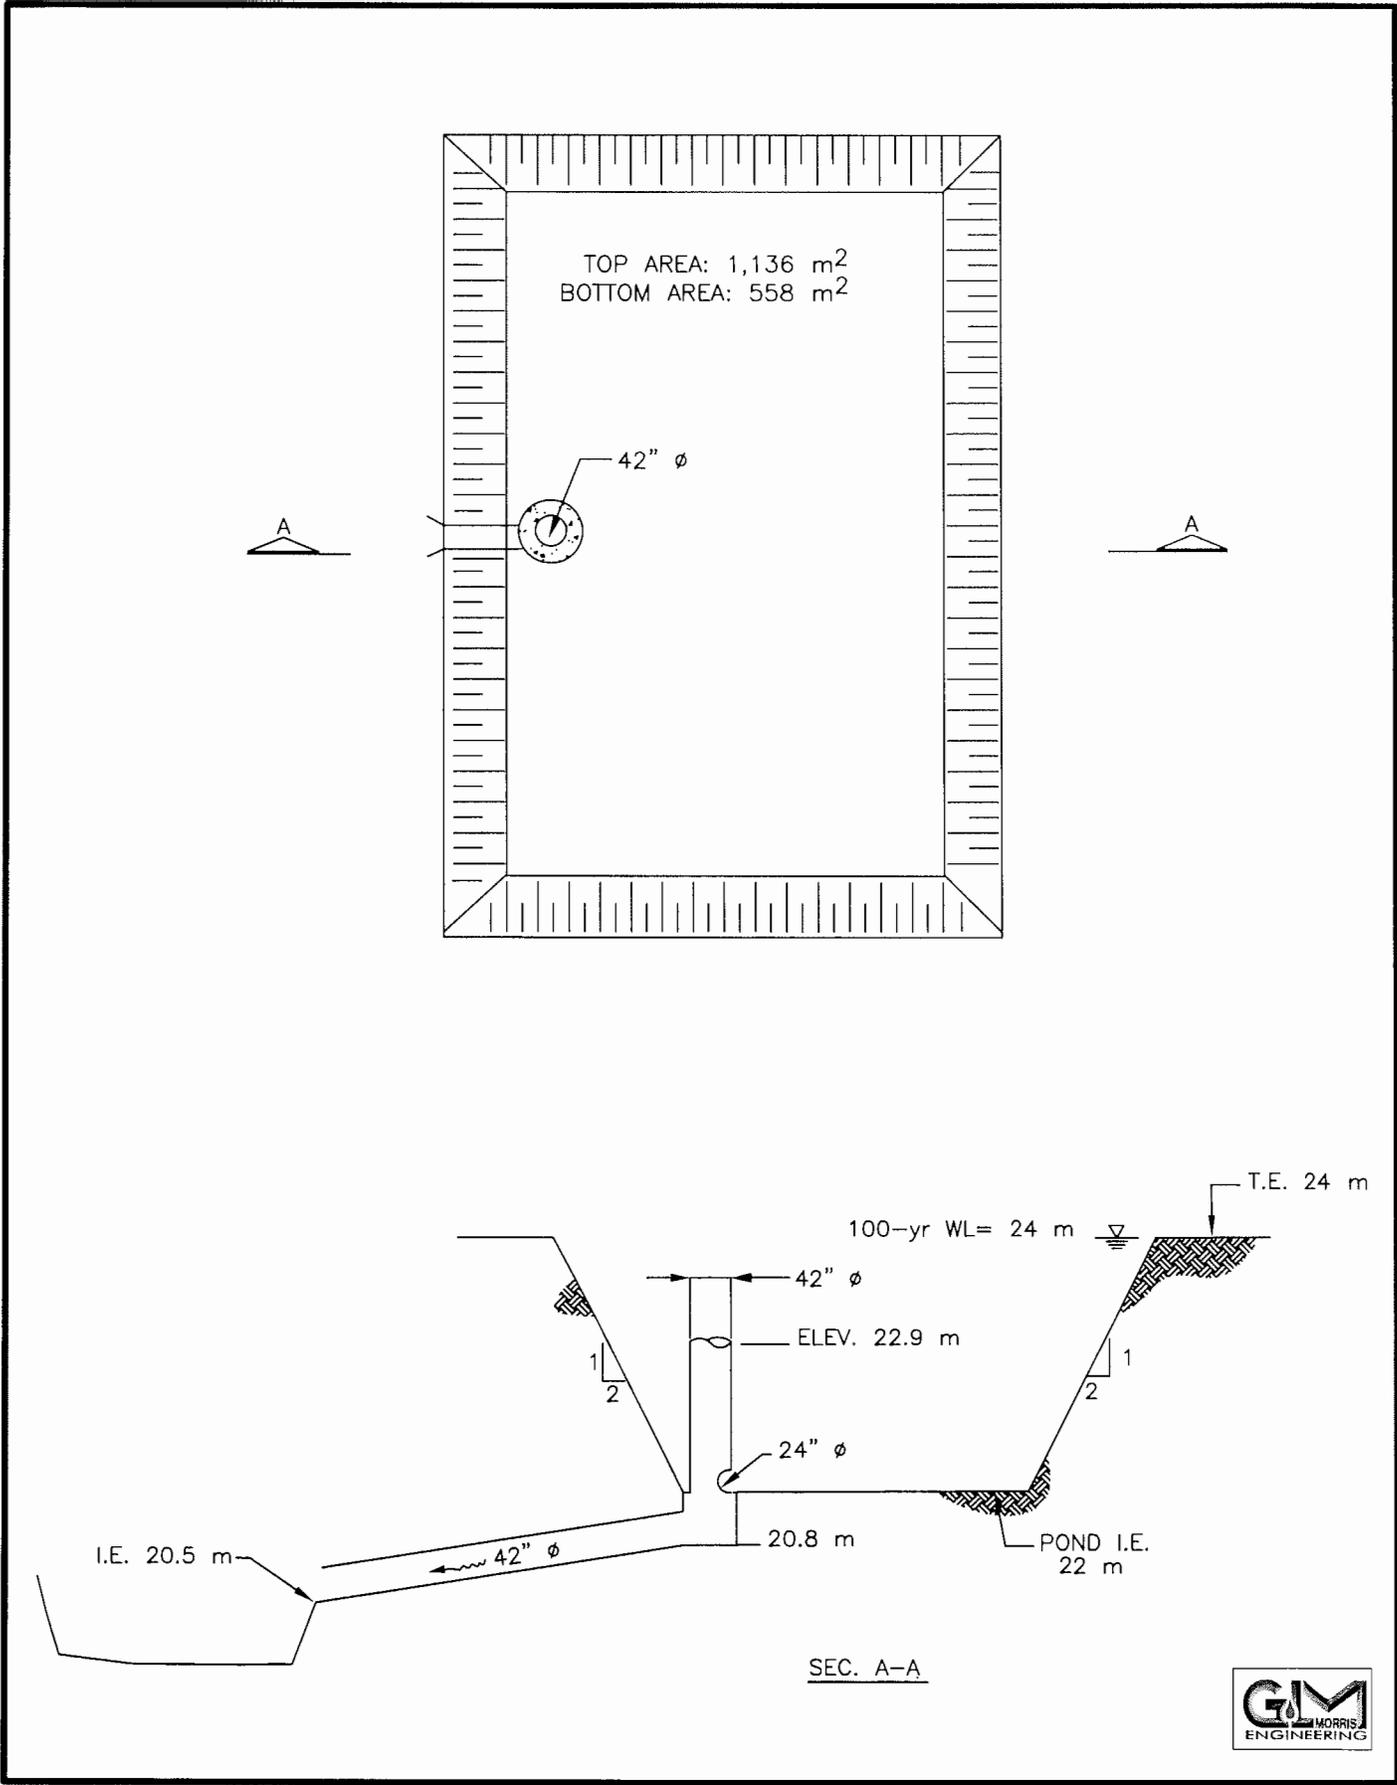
Schematic drawing of proposed detention pond and outlet structure for "Pond SE"
